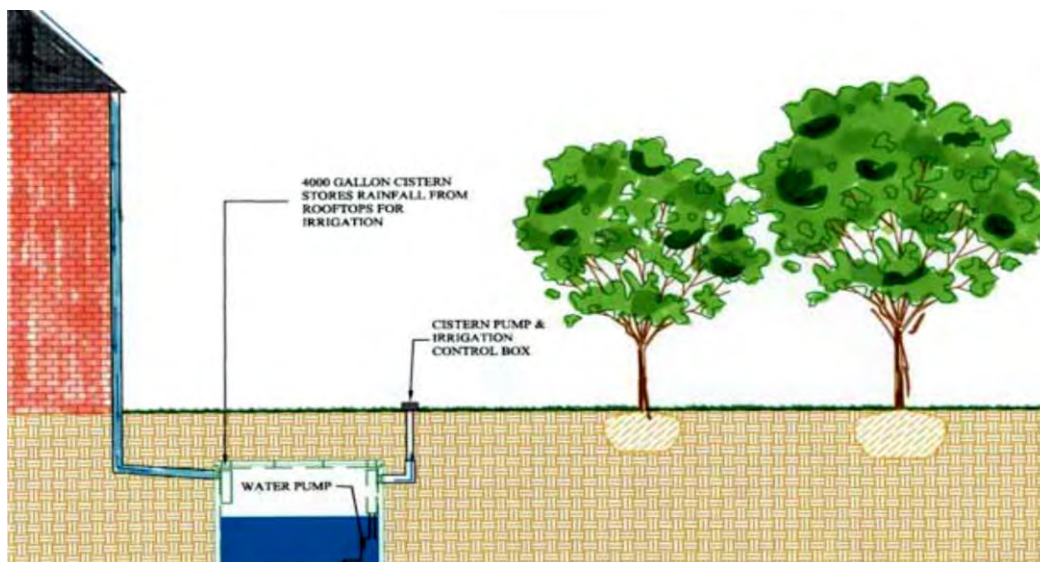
Typical underground rainwater capturing system (Pennsylvania Stormwater Best Management Practices Manual, 2006).
